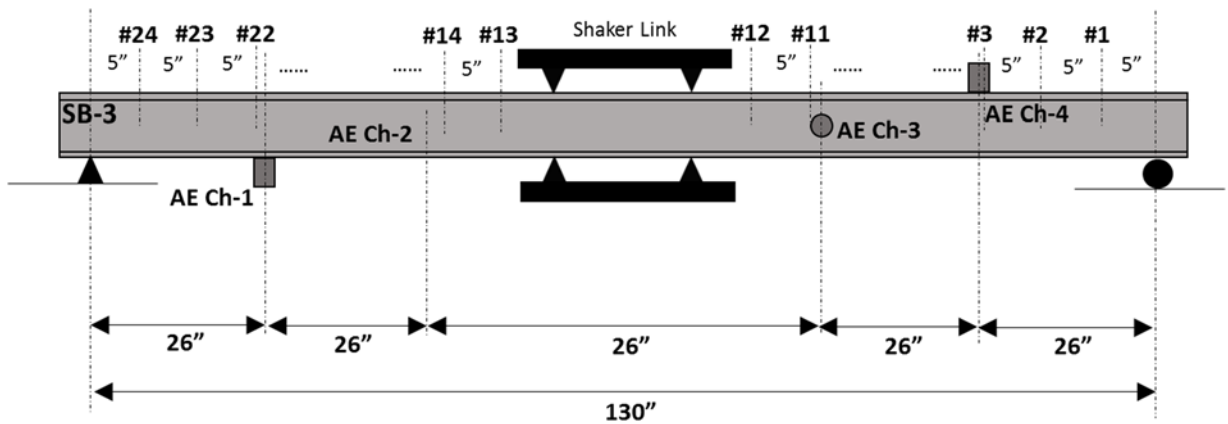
Pencil-lead-break stations for steel beam SB-3.
